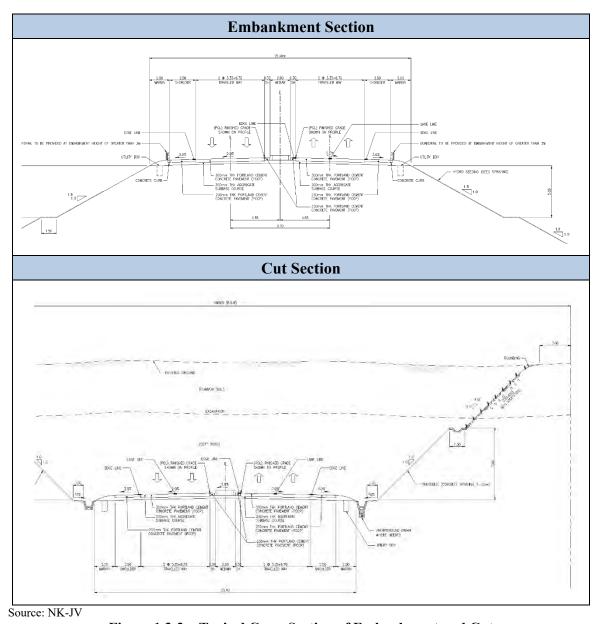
Typical Cross Section of Embankment and Cut
